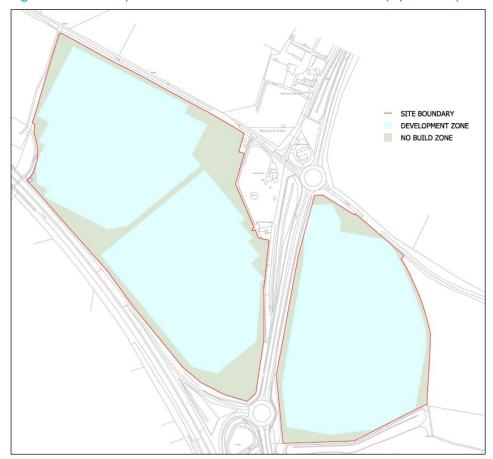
Concept Scheme – Land Use Parameter Plan (April 2021)
